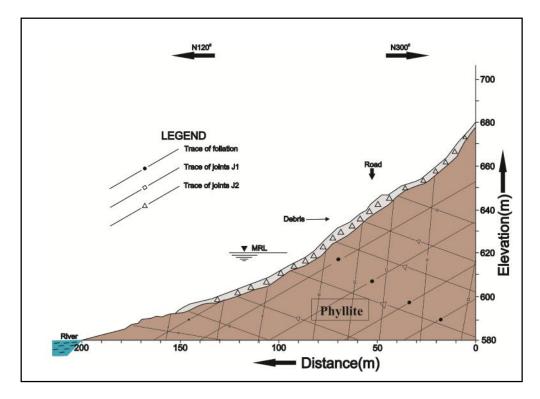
Geological Section of Slope RBS14 Located near THDCIL Guest House
